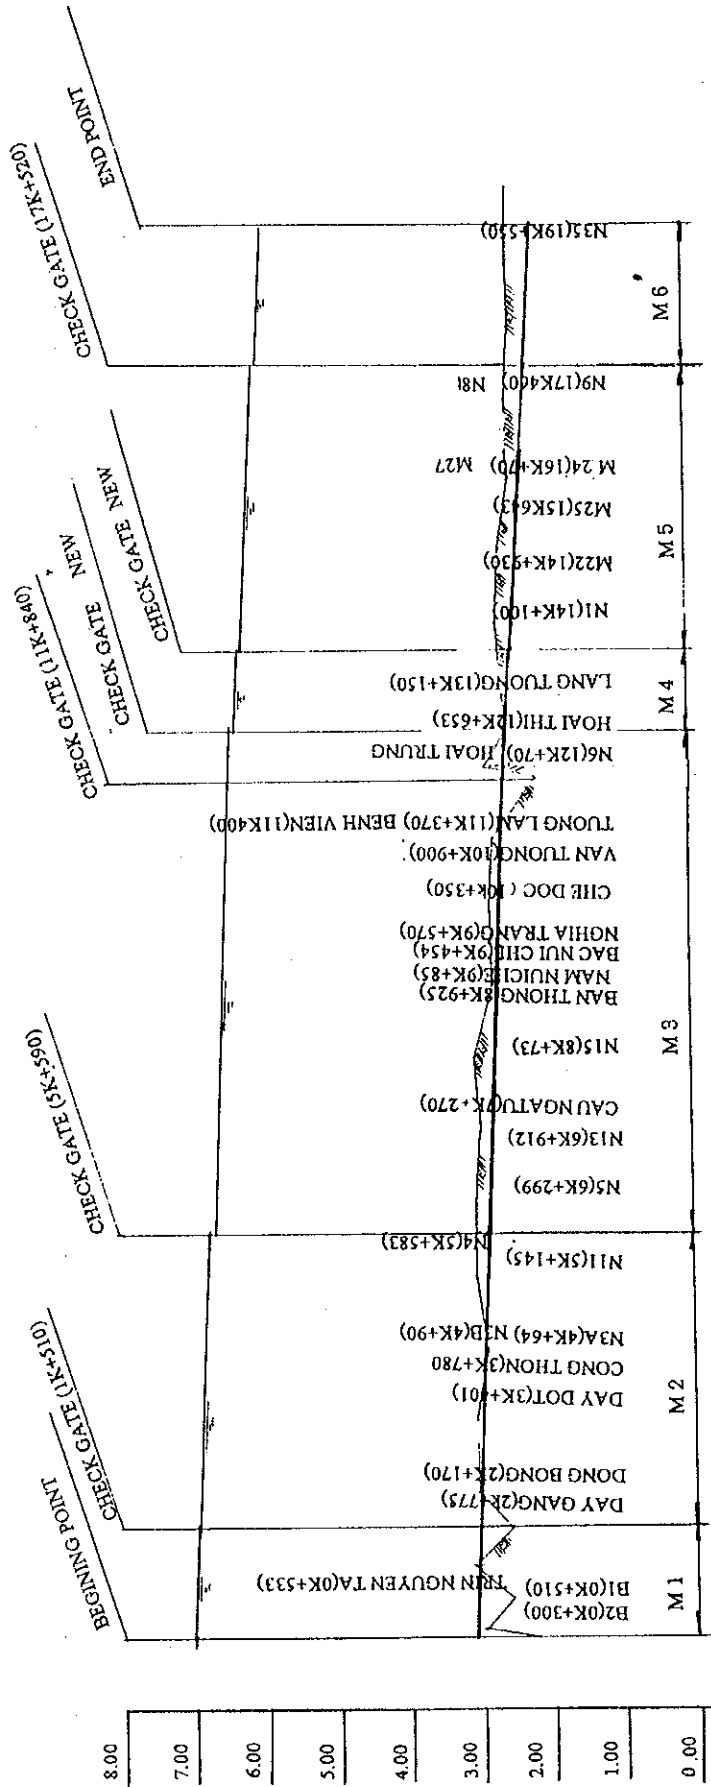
PLAN OF IRRIGATION FACILITIES
